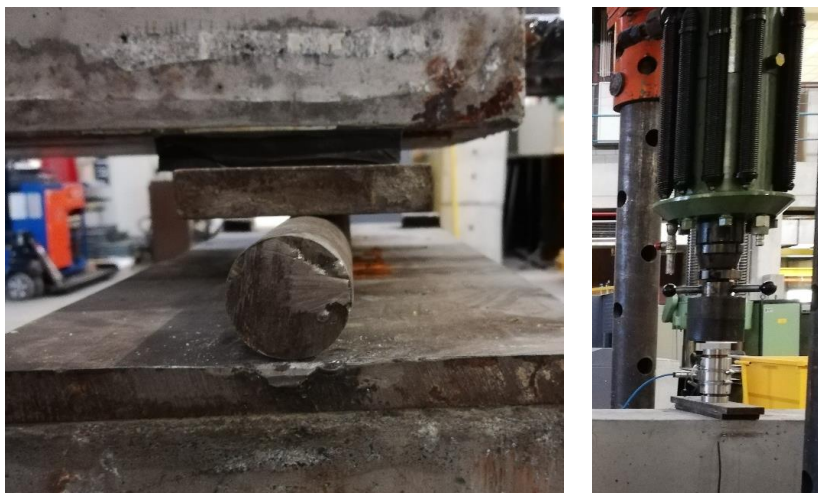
Roller support (left) and detail of jack - load cell – steel plate (right)
